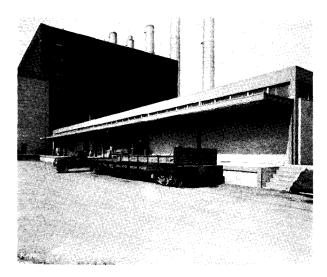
Powerhouse service bay loading dock. Adjacent rail siding and truck yard facilitates material handling.
